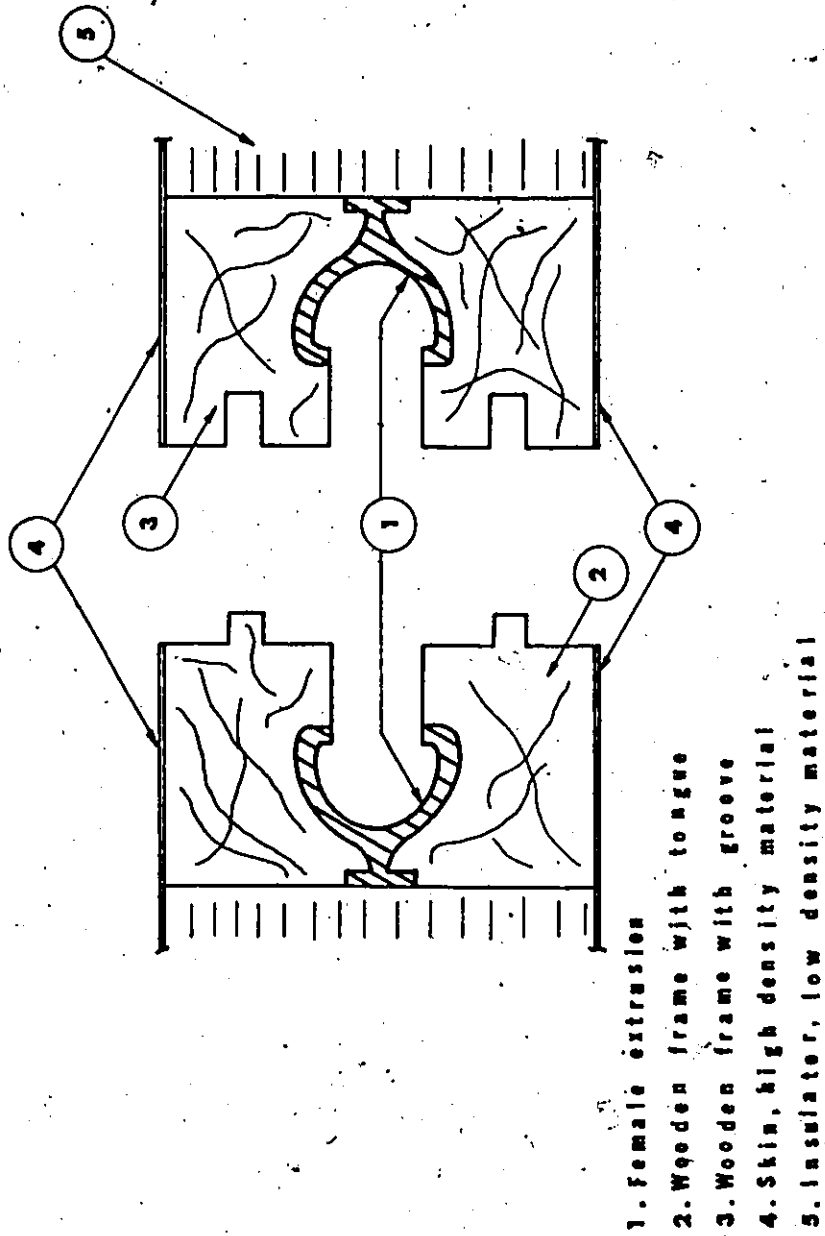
THE TONGUE AND GROOVE ASSEMBLY IN PANELS
